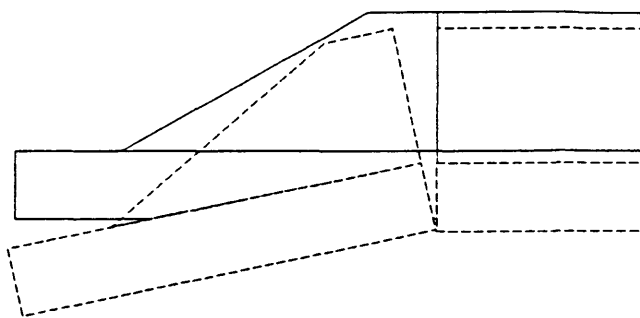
Schematic diagram of assumed mechanism that causes cracks in pavement if horizontal widening method is applied.
